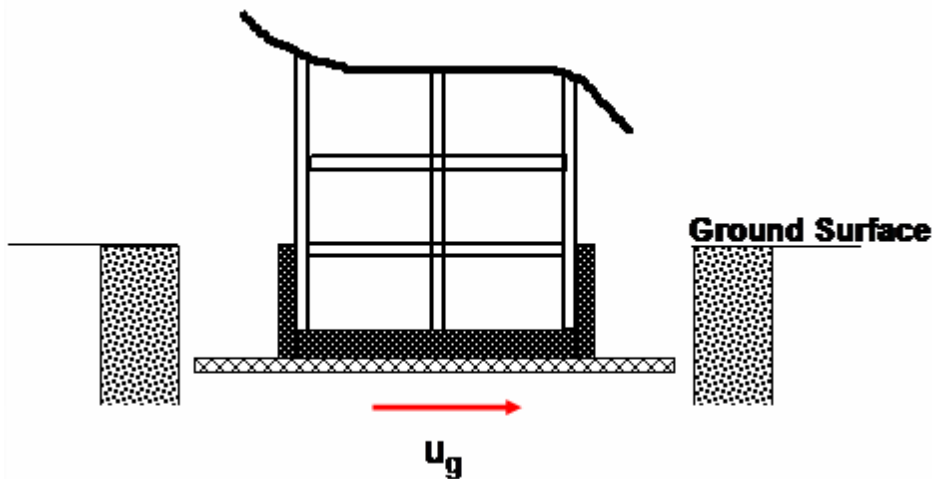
Sketch of simplified model for the building and subterranean levels.
